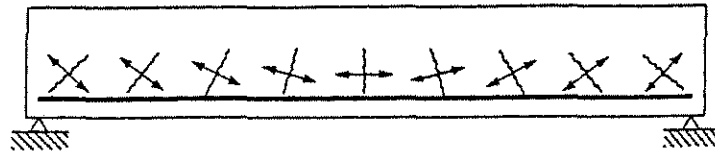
Directions of potential cracks in a simple supported beam.
